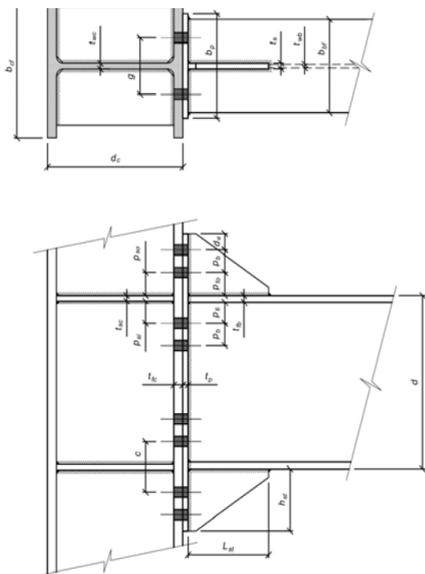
Eight bolt connection with stiffeners, from ANSI/AISC 358, 2010
